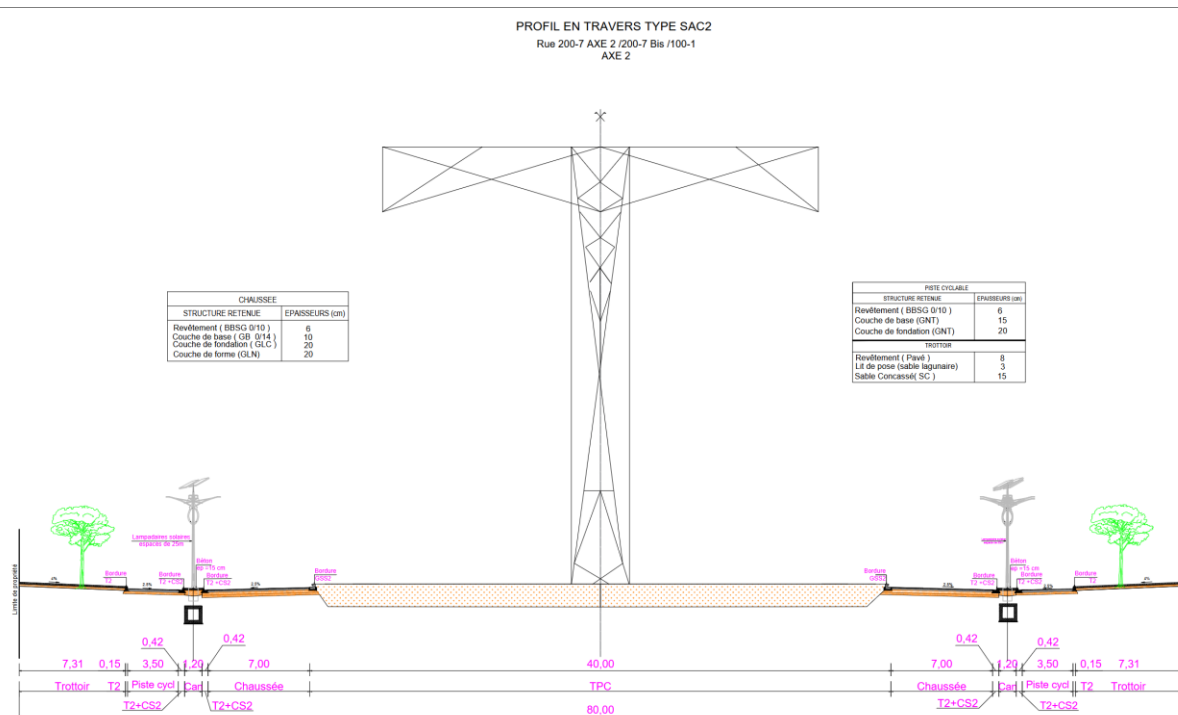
Development of the “rue 200-7 bis” section of the Boulevard Urbain into a green corridor – cross-section
